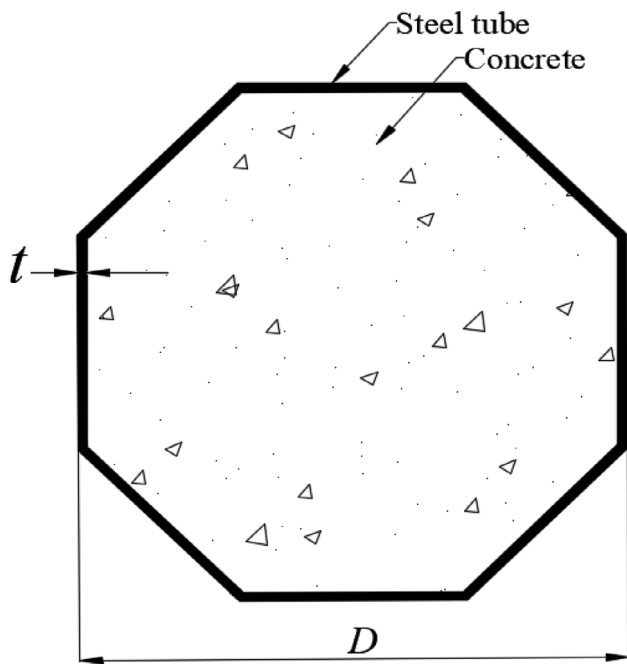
Cross-section of OCFST beam-column. OCFST, octagonal concrete-filled steel tubular.
